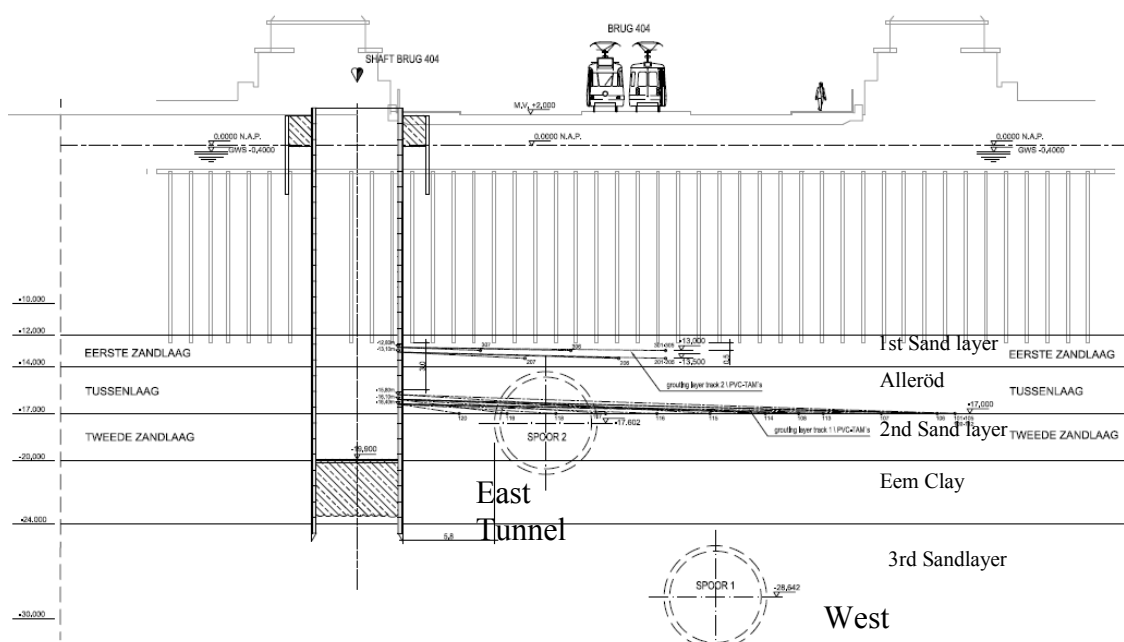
Cross-Section at Bridge 404 showing tunnel locations and compensation grouting pipes
